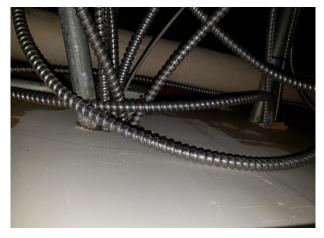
Loc 1; Ceiling cavity; Area proposed to be impacted by renovation work
